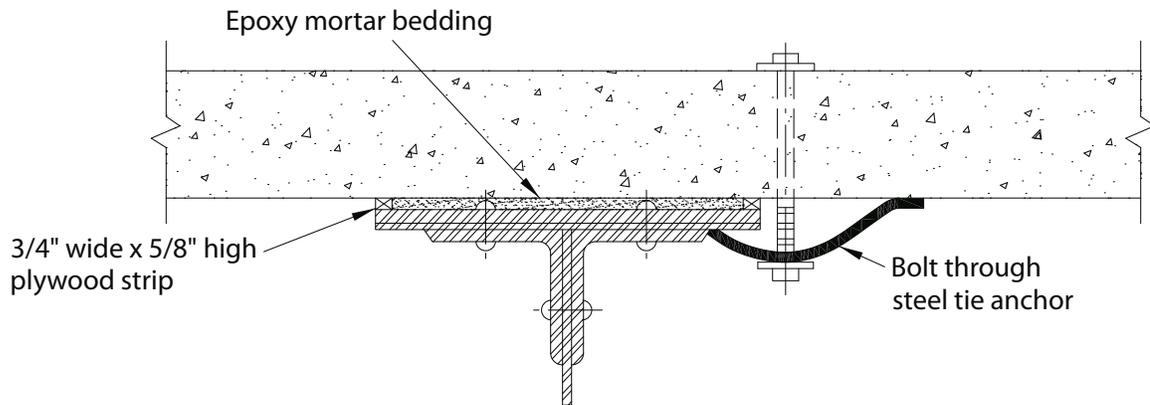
Non-composite deck connection details from Santa Fe Railway Bridge.
